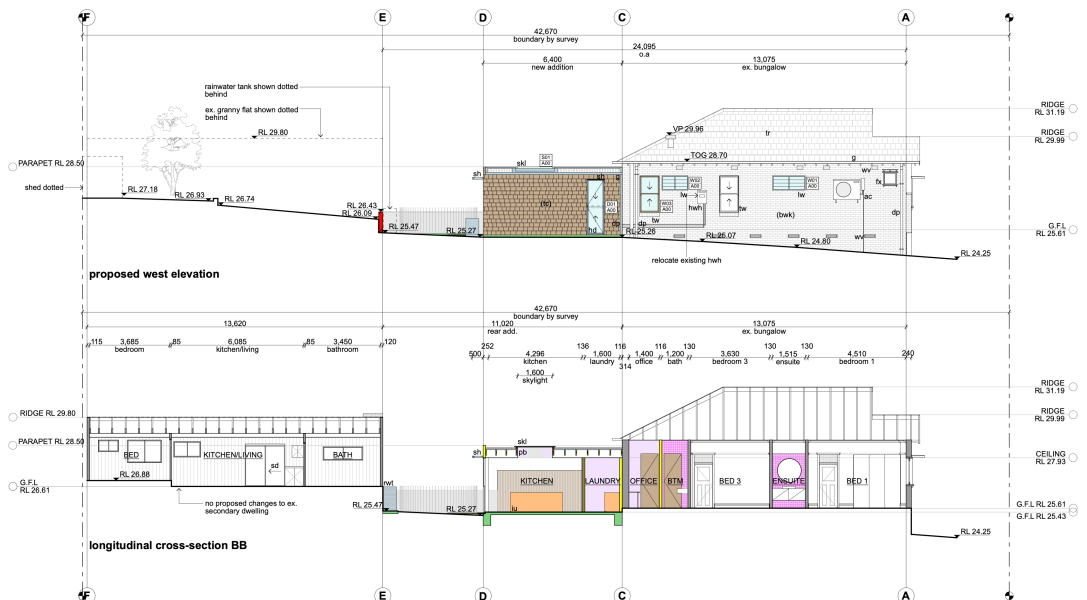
Proposed West Elevation & Cross Section BB (Source: SWAD) - Not to Scale
